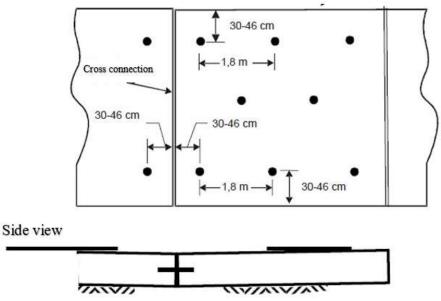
Typical Grouting Hole Patterns to Overcome a Dropped Plate
